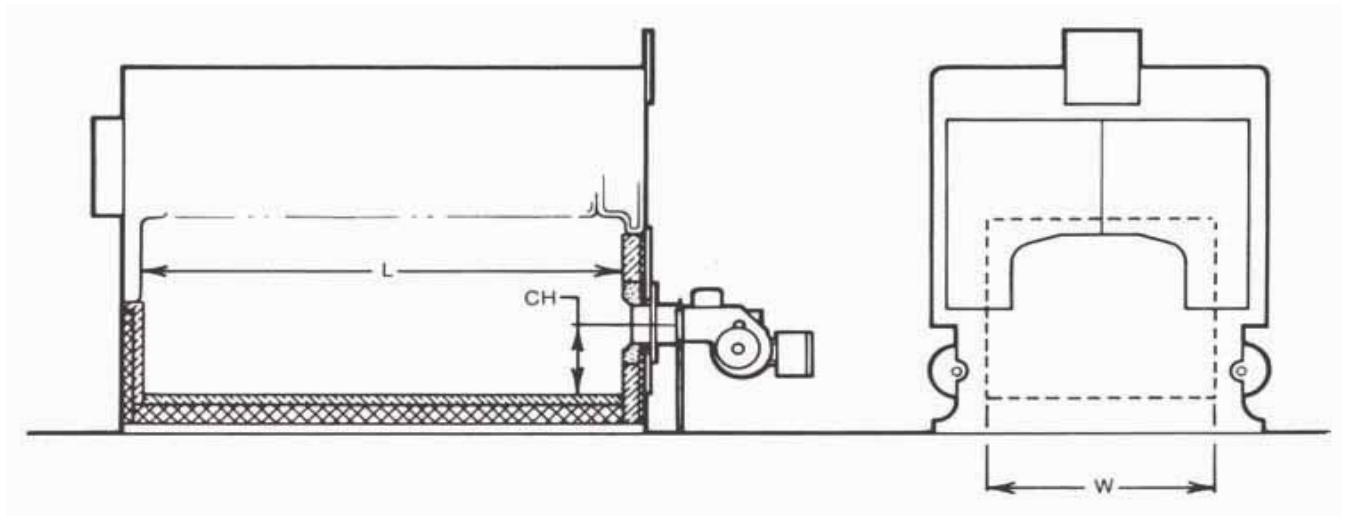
Typical Application to Cast Iron Sectional Boiler
